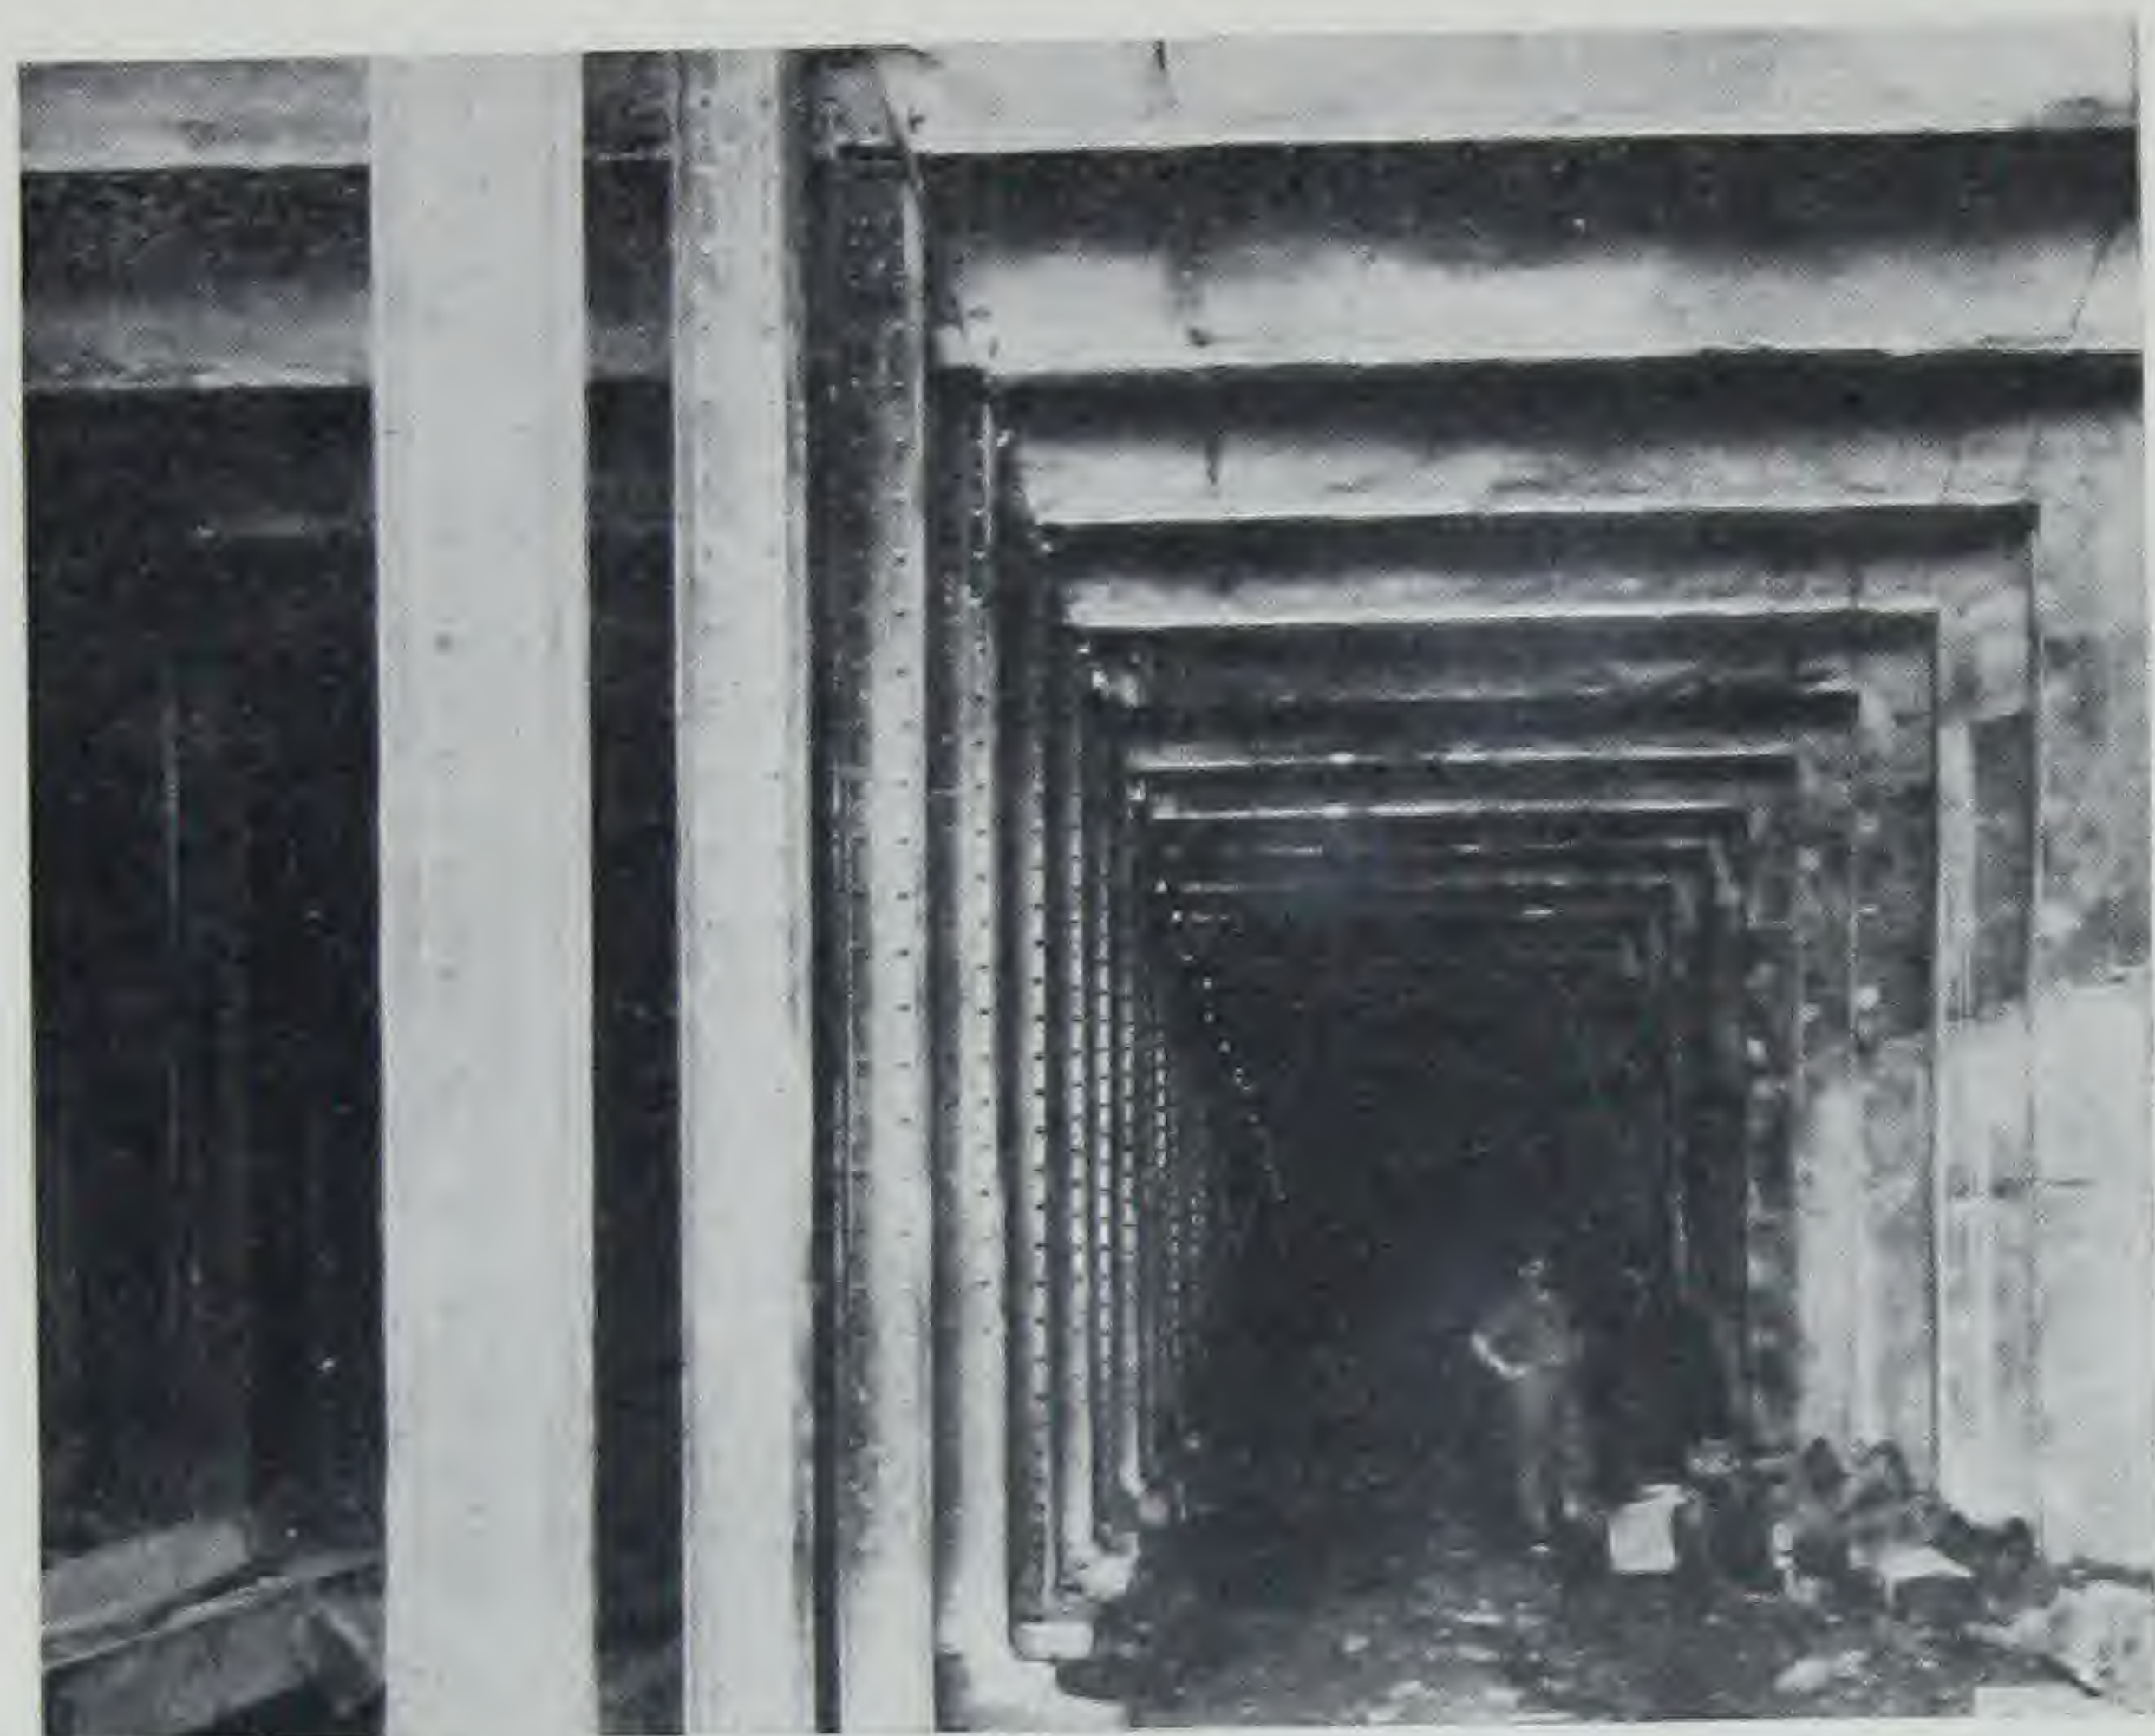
Construction Work by Keystone State Construction Co., in Philadelphia Subway. 4% Celite in 1:2:4 Central Mixed Concrete.
